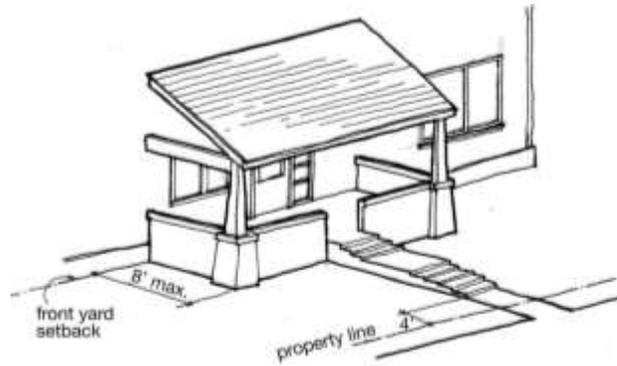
Setbacks, Encroachments, Open Porches or Decks
